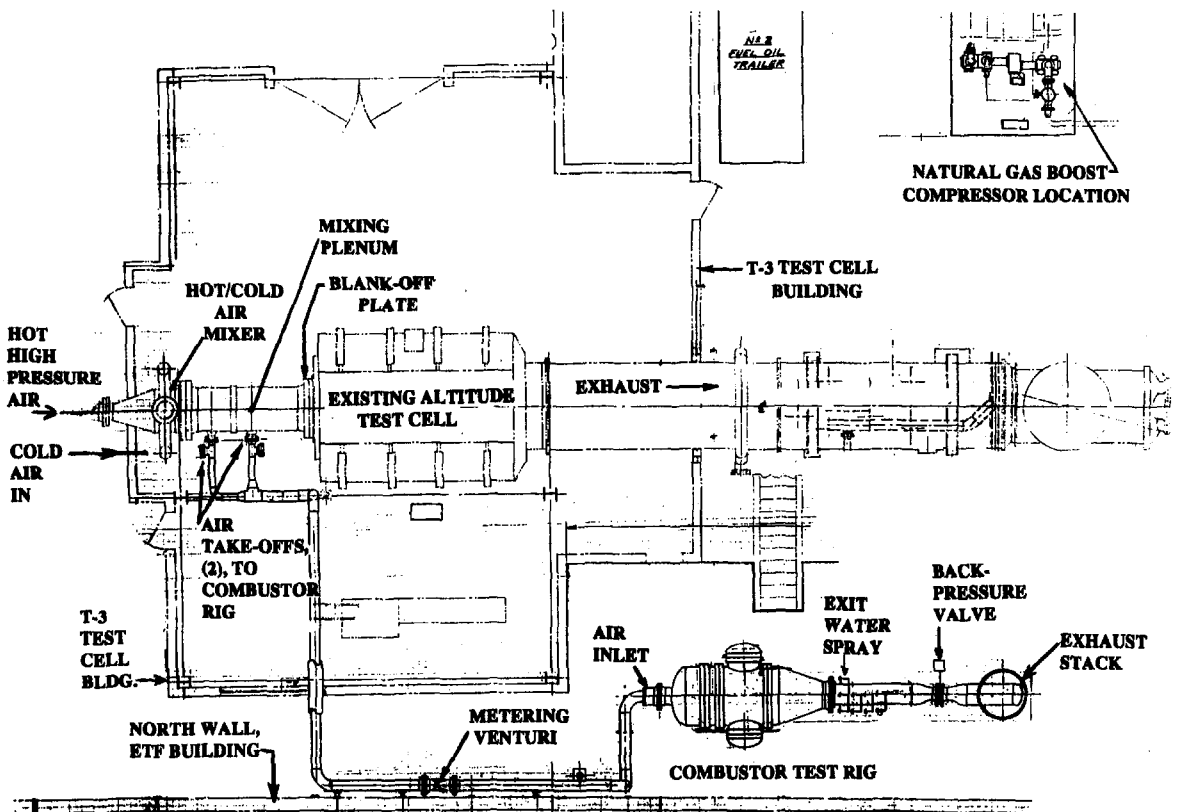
Layout of T-3 area showing final position of Westinghouse test rig
